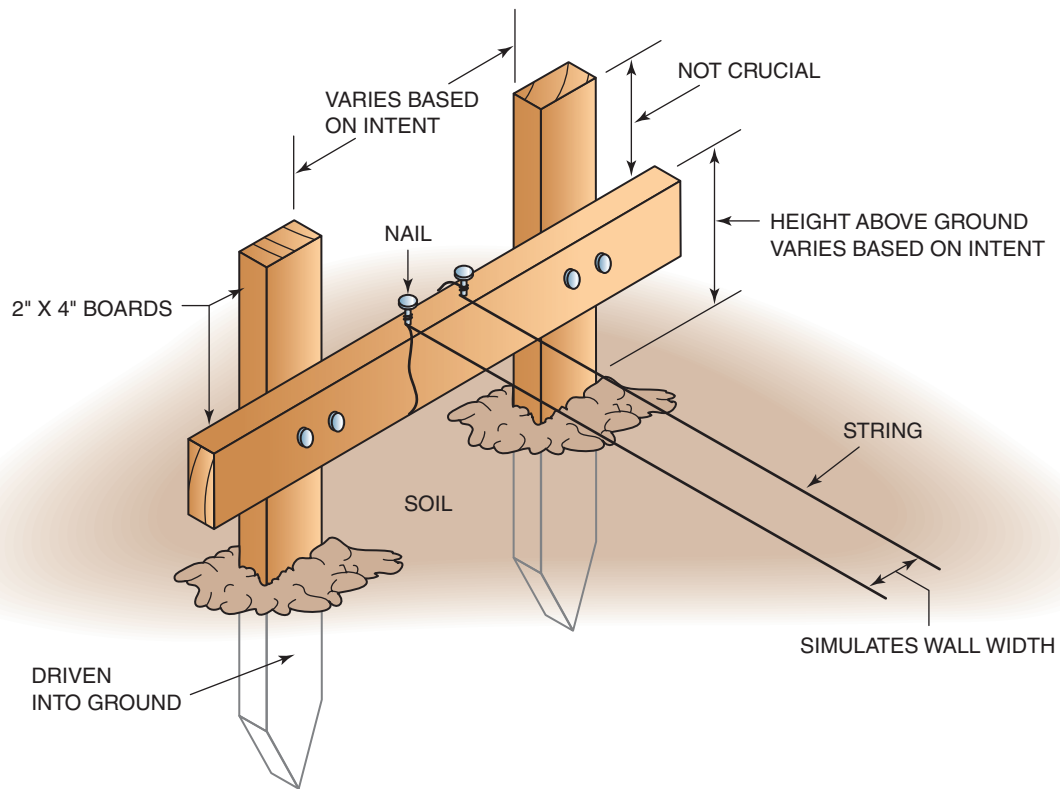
A batter board is fabricated as a securing point for string to simulate a future wall location.
